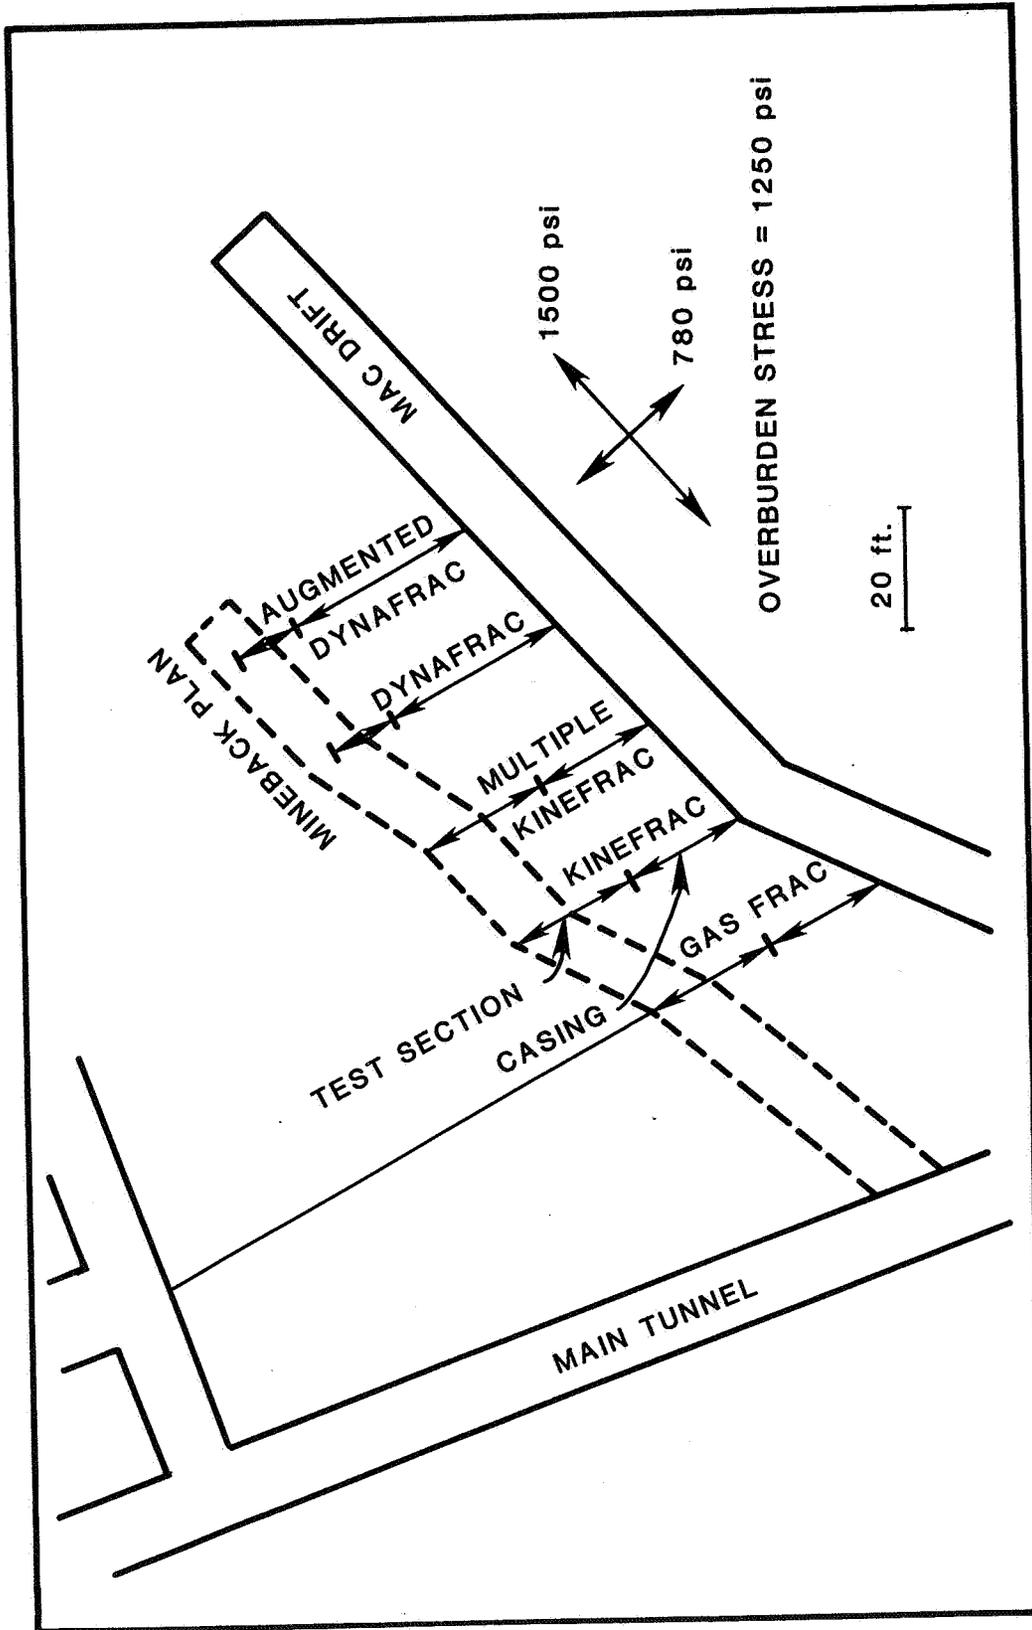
Tunnel Plan for Multi-Frac Test Series with Proposed Mineback Route
